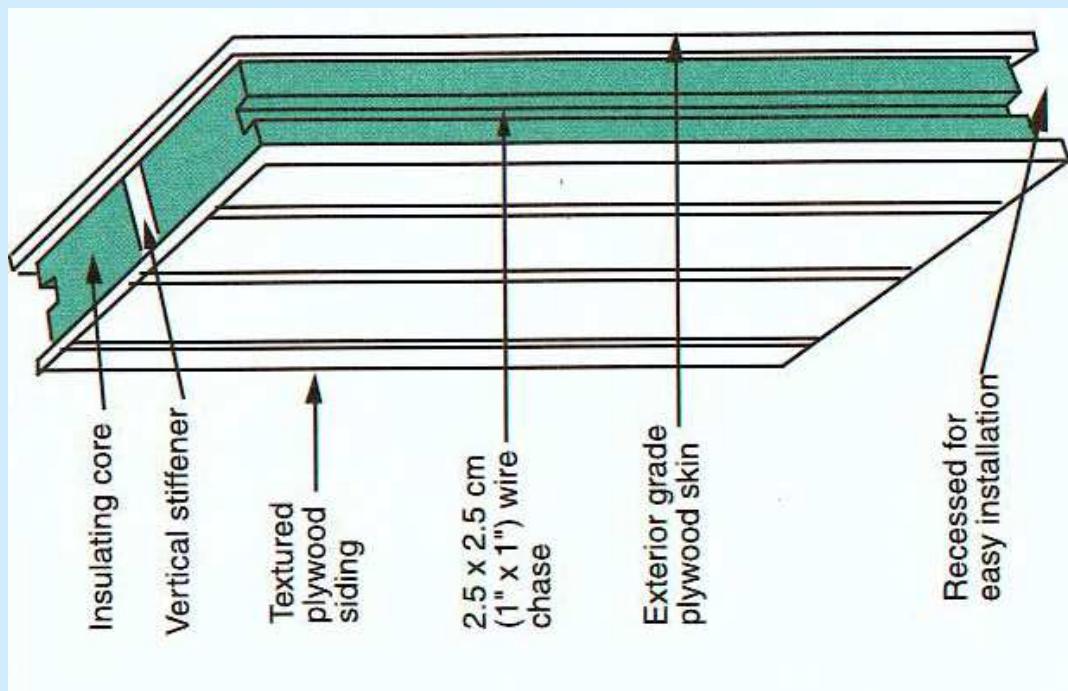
Sample Pre-formed Panel Wall System, Corner Detail
